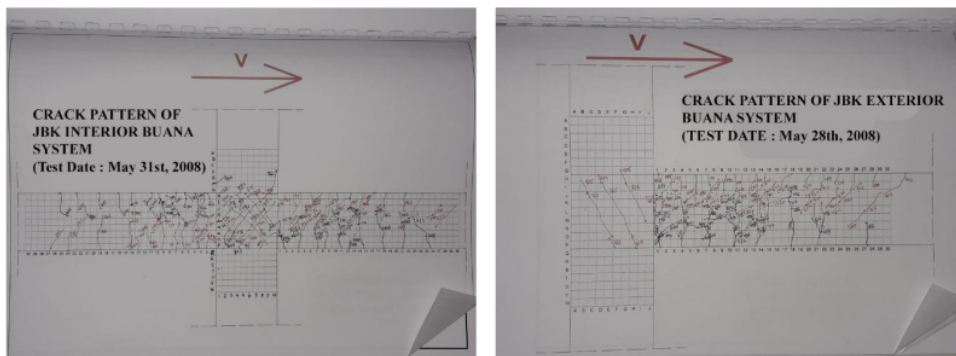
Crack pattern at interior and exterior beam-column joints during testing in Laboratory
